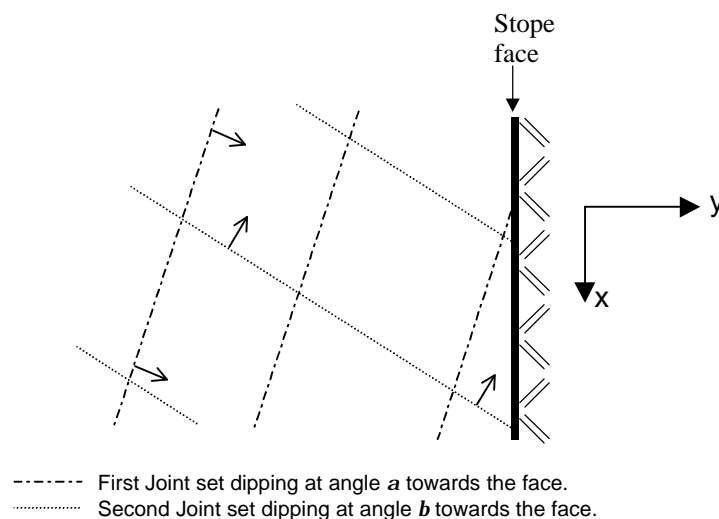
Hangingwall discretised by two joint sets in a shallow mining environment.
